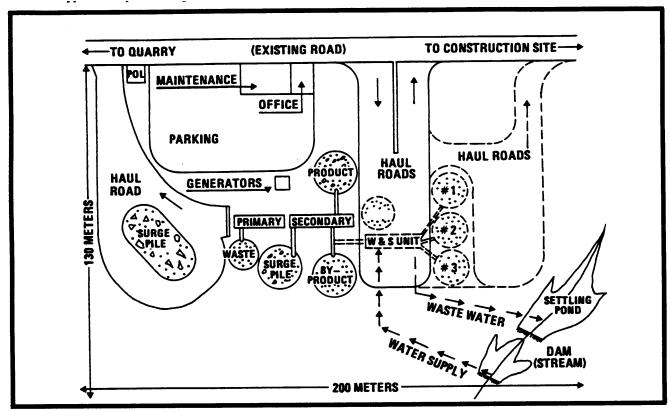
Typical Layout for a Long Duration Rock Processing Plant
